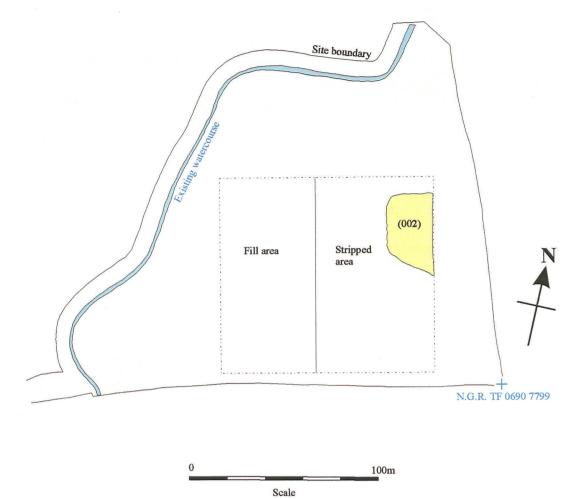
Plan showing site with stripped area and portion of natural exposed. 1:2,000
